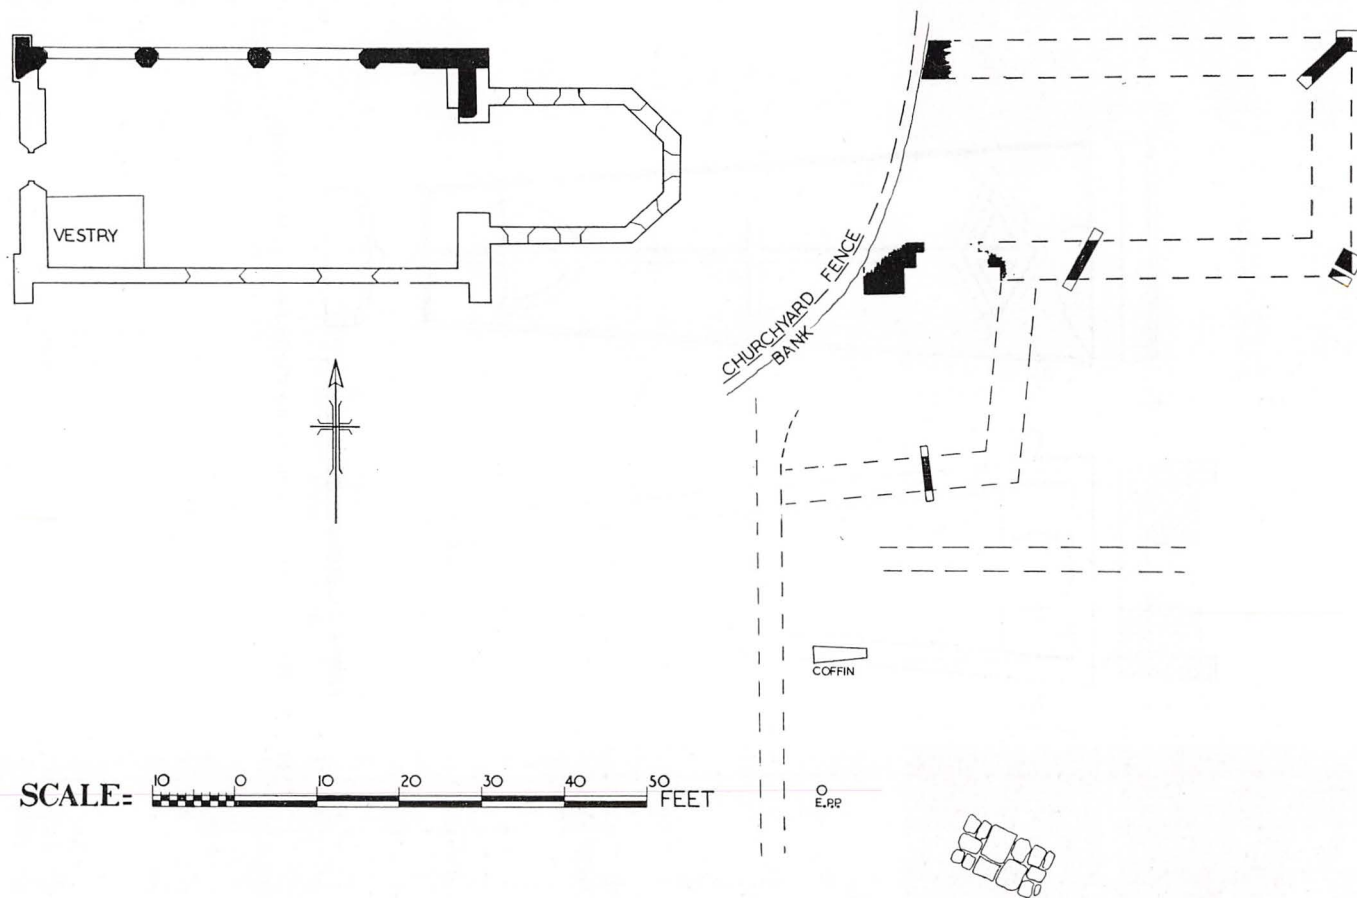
Plan of the church of St. Mary Wix, wall foundations and find spot of stone coffin.
